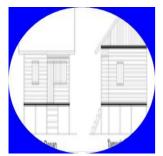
(Left) The Observation Unit 1; (Right) The Structure and Construction of the Observation Unit 1
